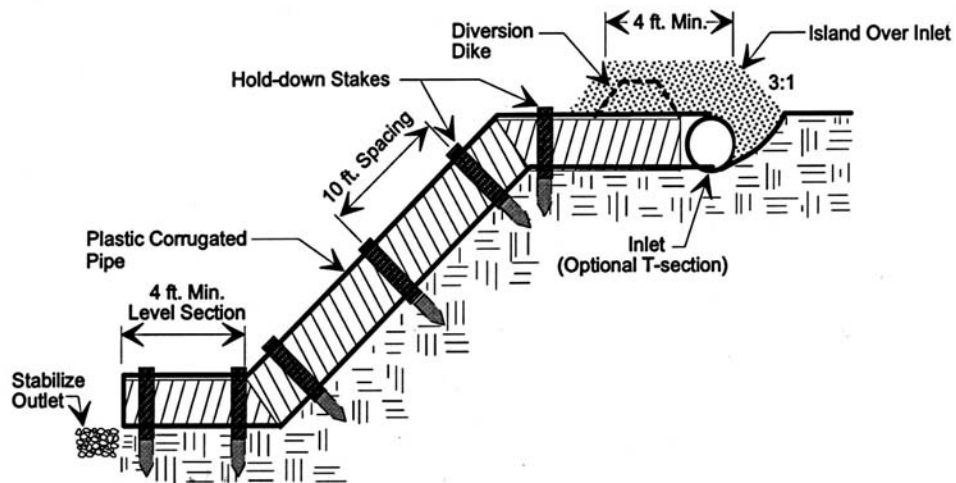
Typical Cross Section of Temporary Slope Drain with Optional T-section Inlet
